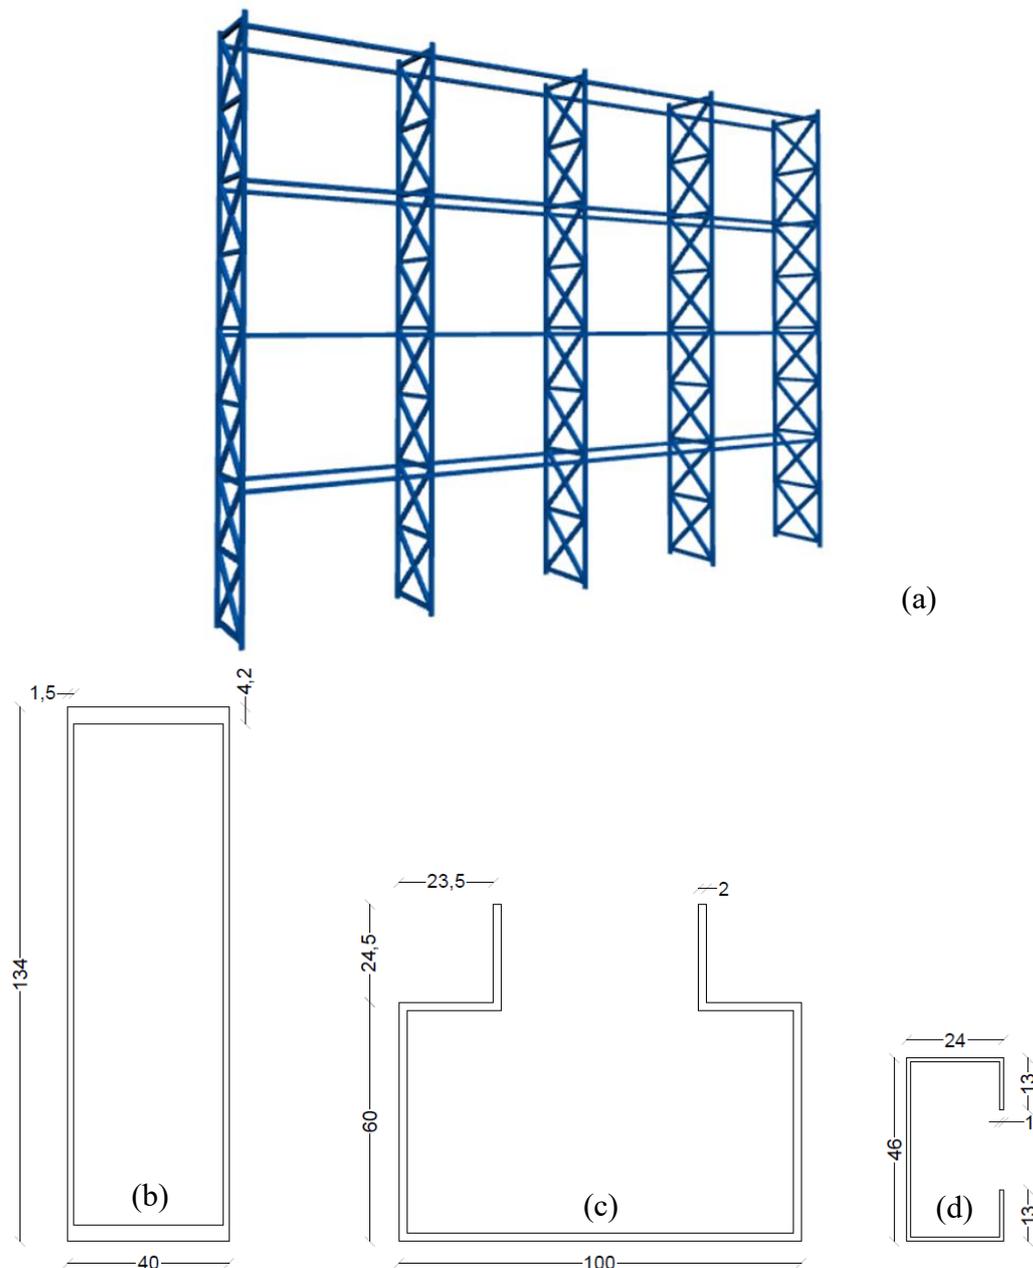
Case study steel storage pallet rack and the corresponding cross-sections (mm) of the structural elements.
